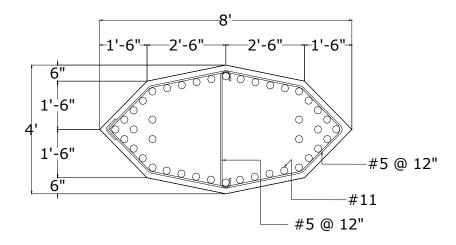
Cross Section of 8WD and 9WD Columns of 1RWD Off-Ramp (drawing not to scale)
